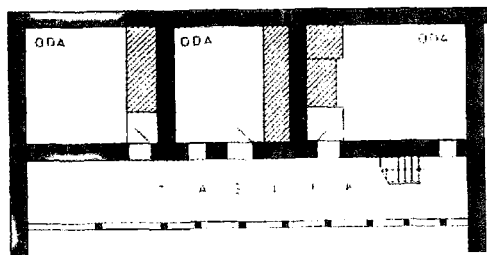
The ground floor plan of the Malike house. Source: Eldem (1984a).
